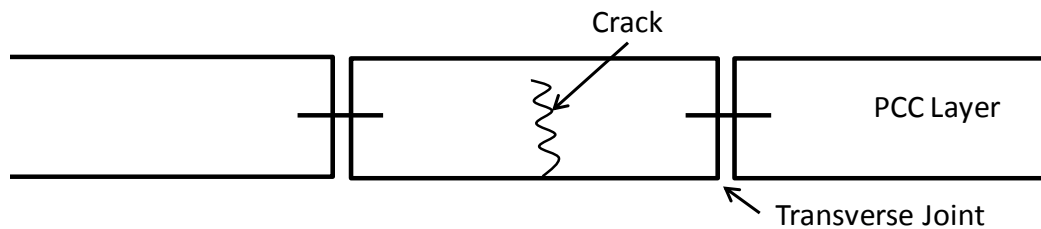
Bottom-up fatigue cracking in JPCP.
